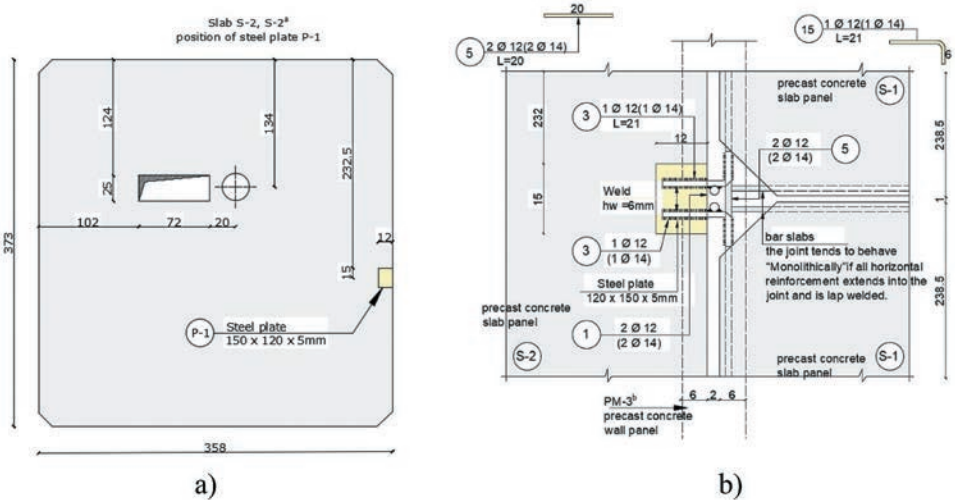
Floor slab connections: a) plan of a slab panel showing the connection location (P-1) and b) detail of a joint between the adjacent slab panels (horizontal section).
